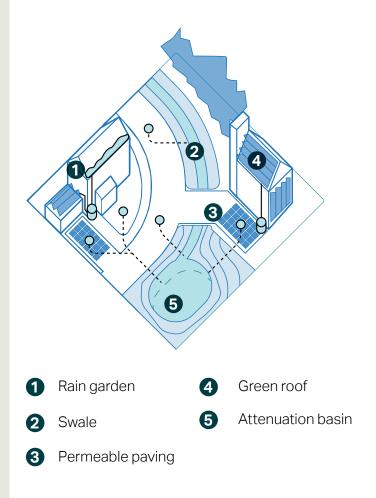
Diagram showing the best use of harvesting water systems rain garden, swales, permeable paving, green roofs
